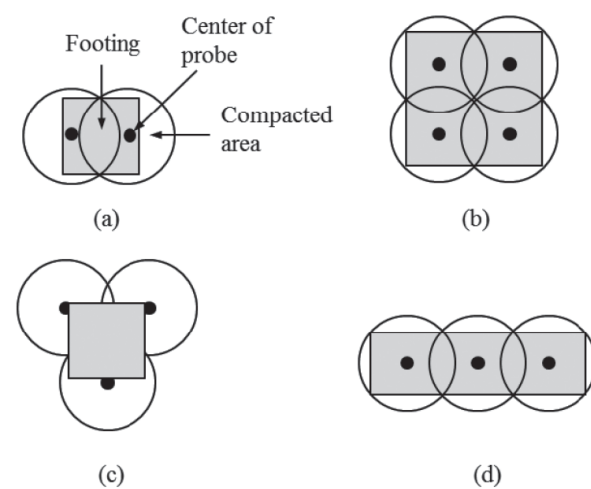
Typical arrangements of compaction probe points below isolated and strip footings (modified from Kirsch and Kirsch, 2010).
